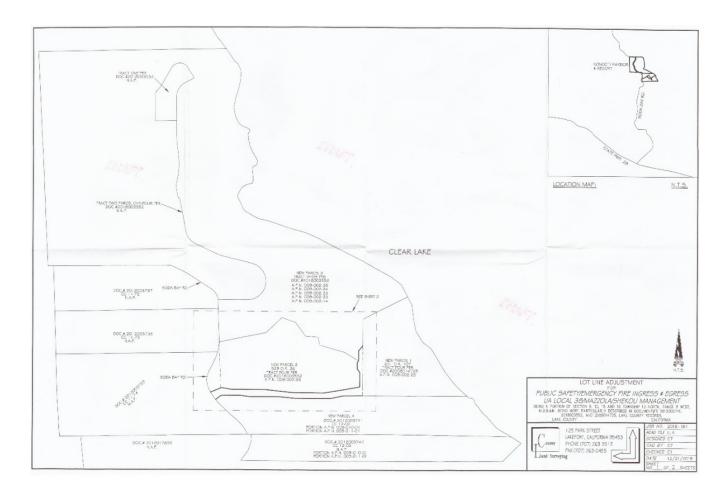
Proposed road access in between two parcels drafted from private engineering firm
